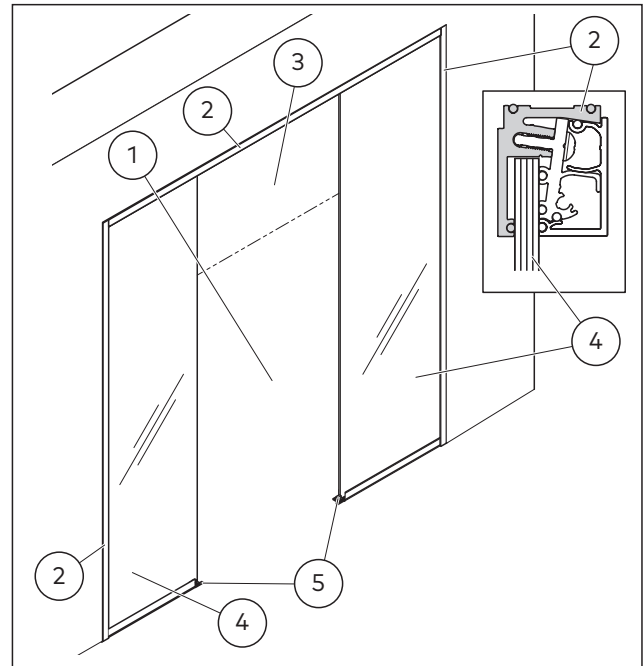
Installation situation between glass elements and with planned overpanel as an example
